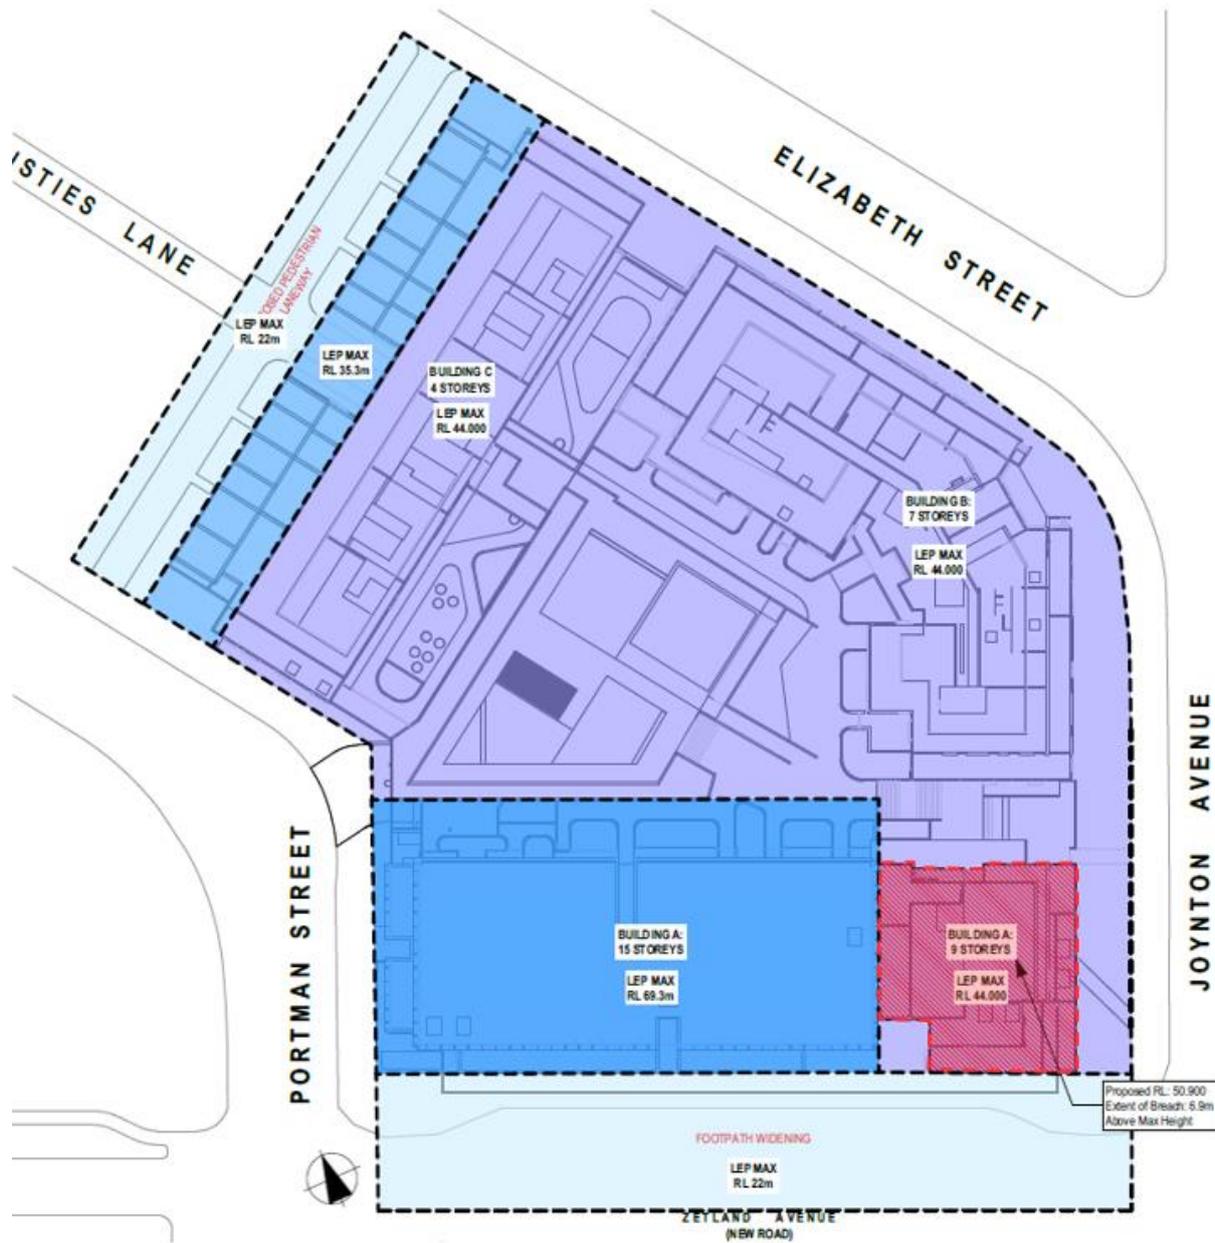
Site plan of the permitted and proposed maximum building heights for the development. The proposed non-compliance (relating to the south-east corner of Building A) is outlined in red hatched lines.
